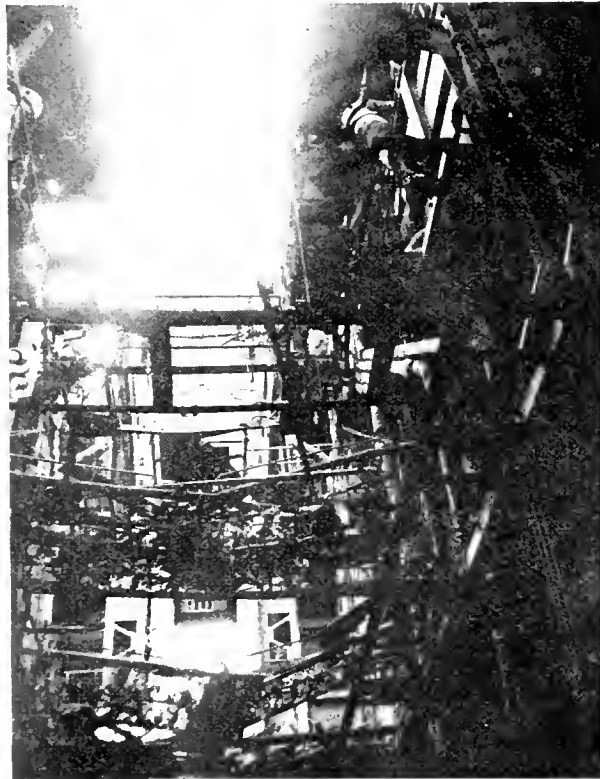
Looking up between boilers No. 1 and No. 2, showing damage to boilers, light iron, sky light support and bomb hit on stack No. 1.
